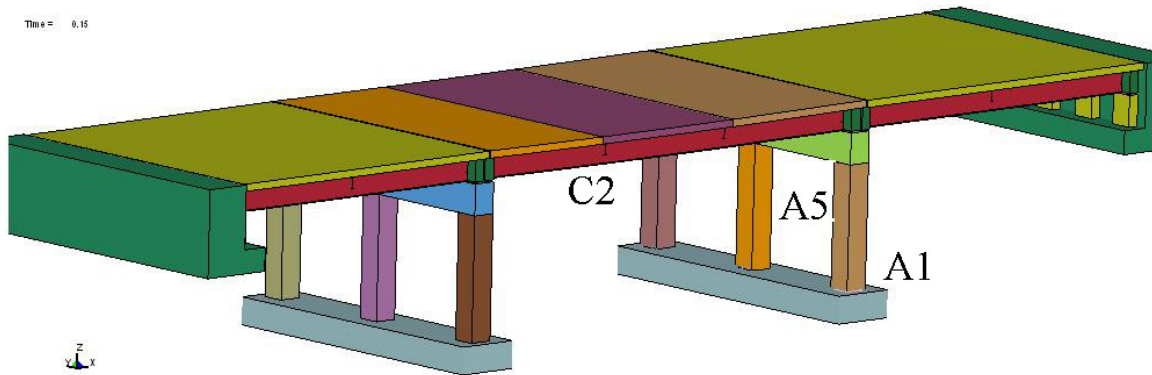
Damage Mechanisms during Bridge with 5000 psi Concrete, New York
